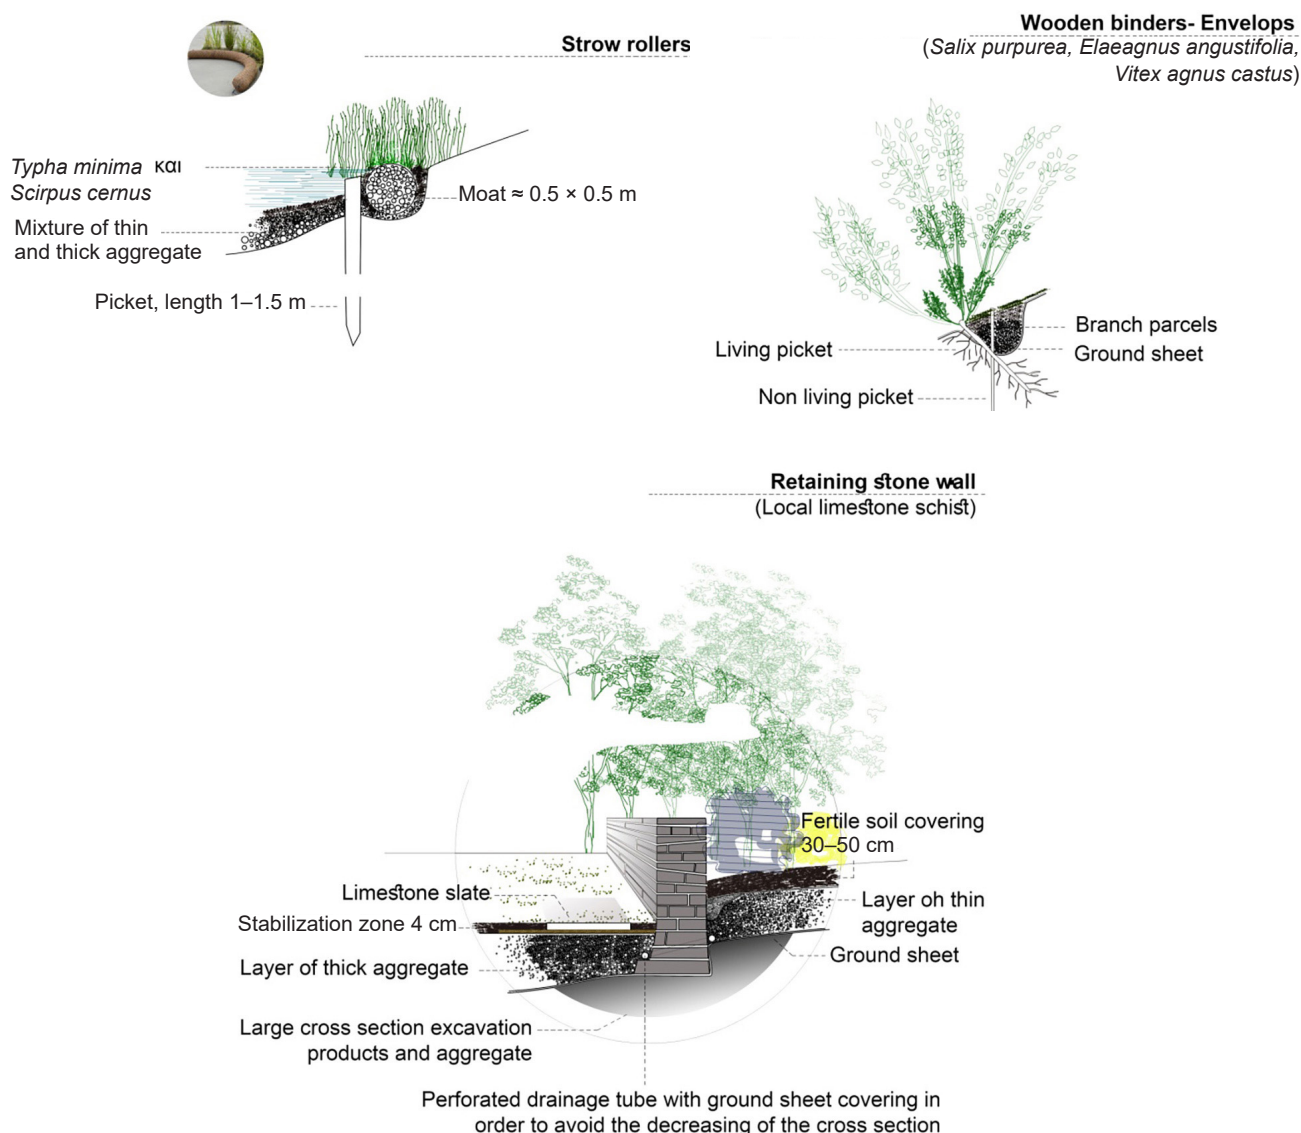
Construction details of the retaining limestone wall, the envelopes, and the strow rollers
